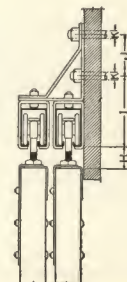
Cross-section showing side wall bracket attachment without weatherstrip, of two parallel sliding doors.
